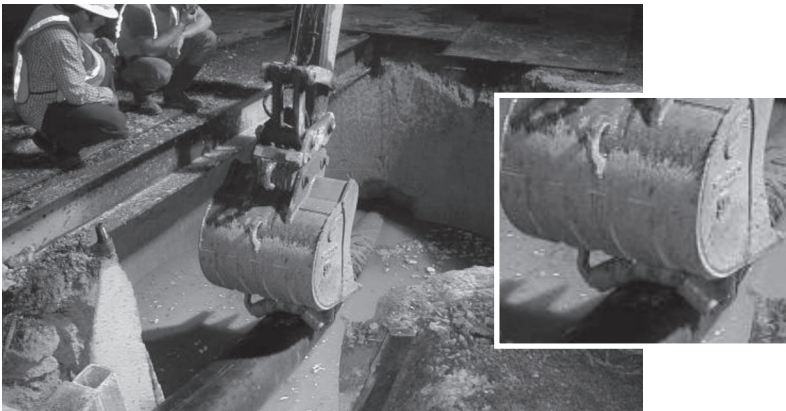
Protecting the PE Pipe from Groves Using Welded Wheels on the Bucket
